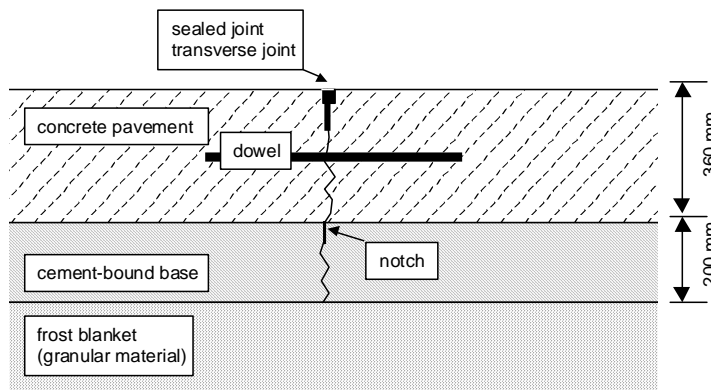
Sealed, doweled transverse joint in the runway concrete pavement, the cement-bound base is notched underneath the joint
